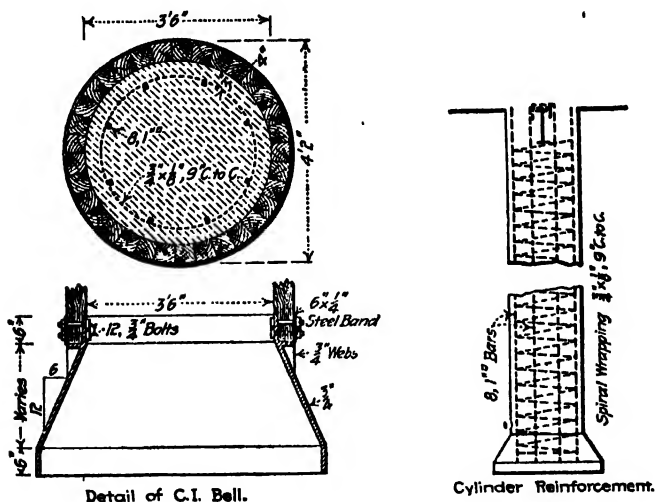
Cylinder Caisson for Foundations of Shipping Pier at San Francisco, Cal.
